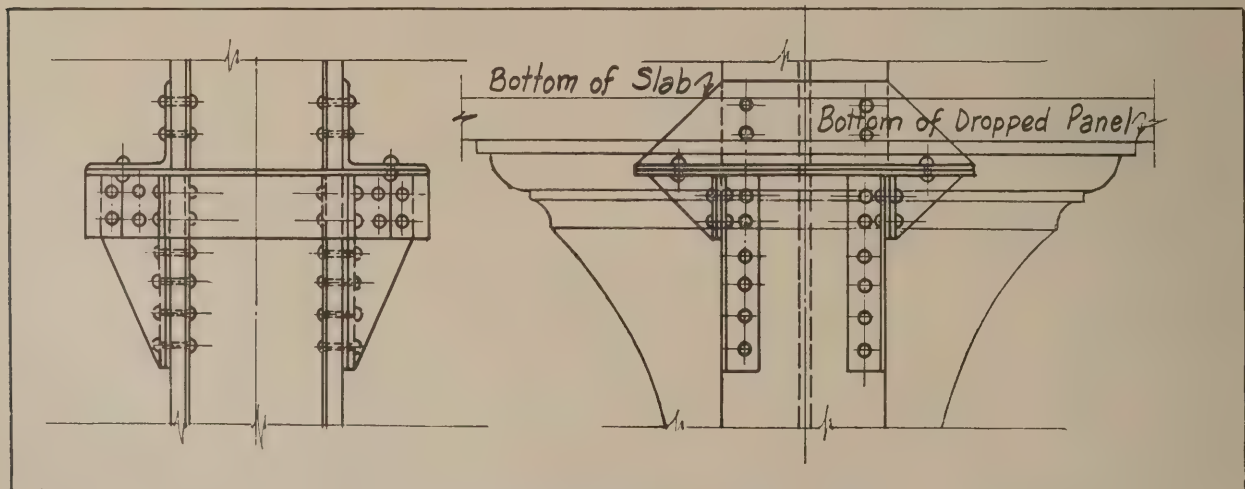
Type of Bracket Placed Below Floor Slab, Encased in Capital
